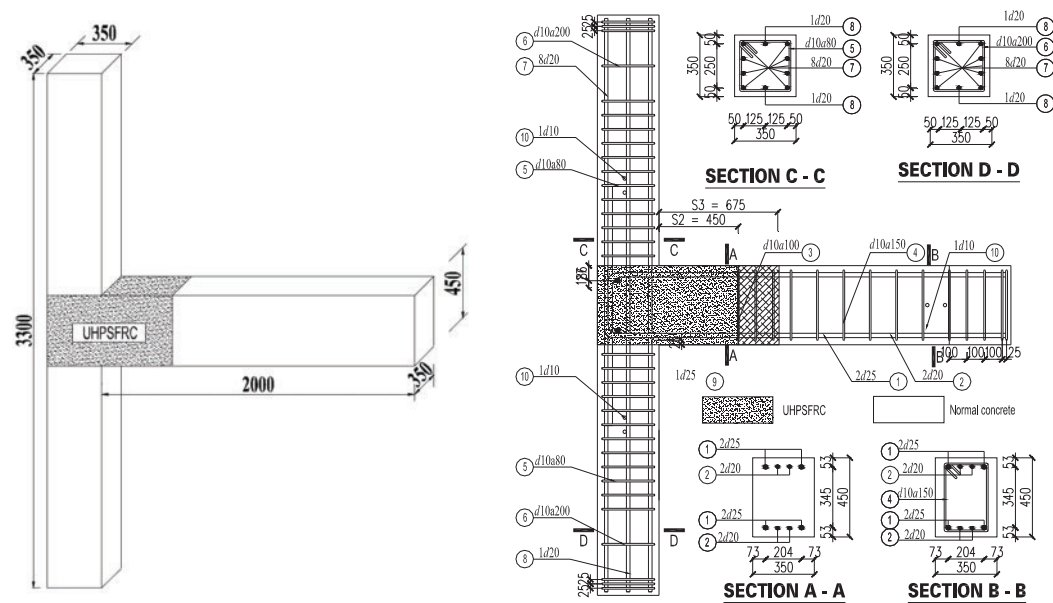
Geometric dimensions of the test specimen (Unit: mm)
